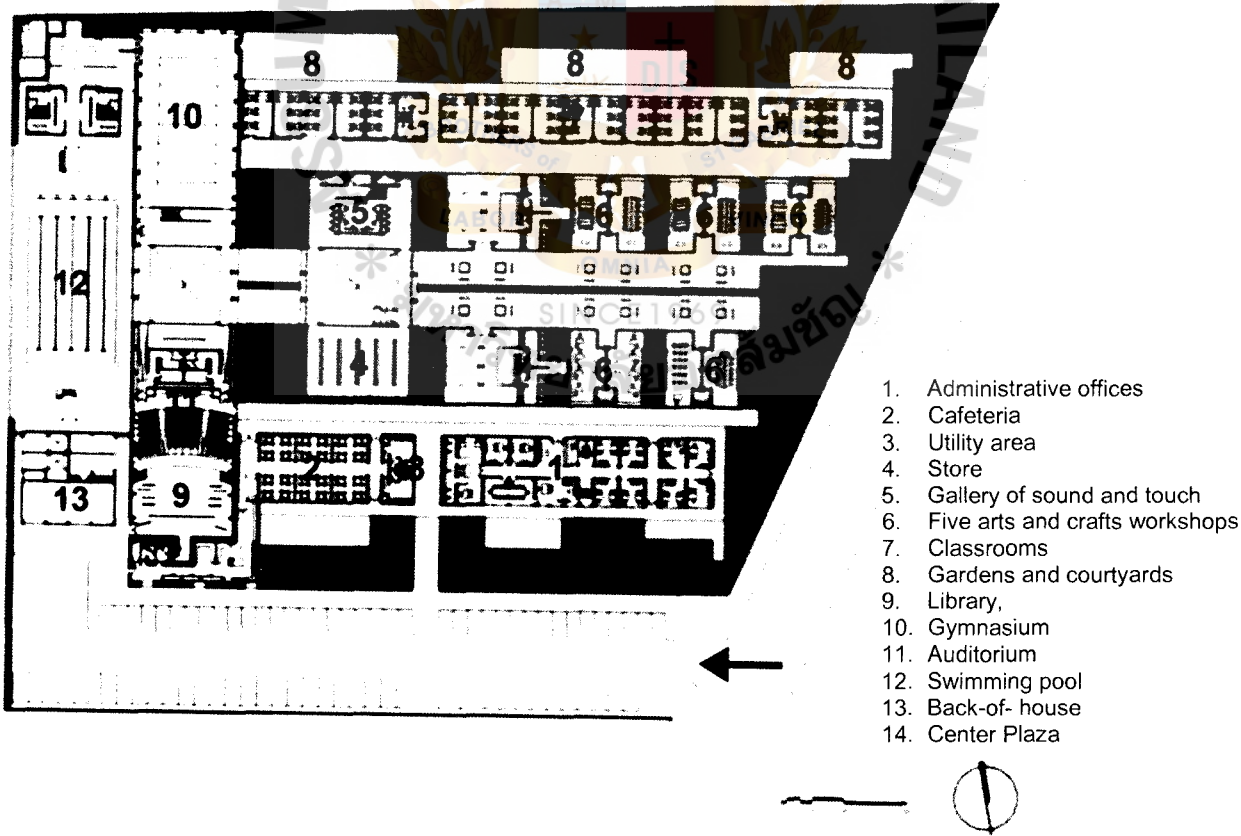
FLOOR PLAN: CENTER FOR THE BLIND AND VISUALLY IMPAIRED
